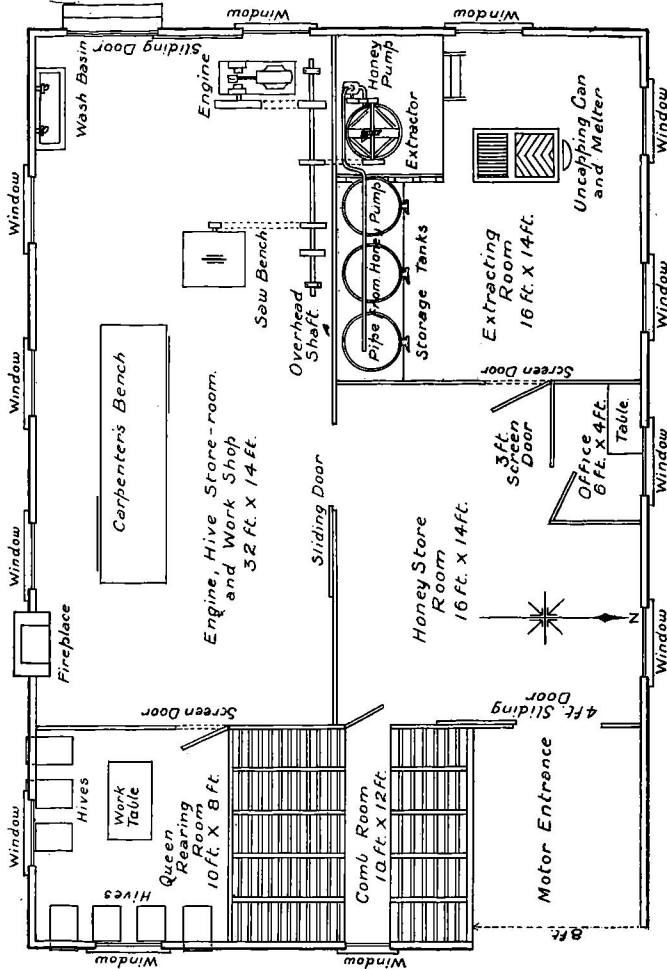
The author's idea of a complete modern apiary building under one roof.
